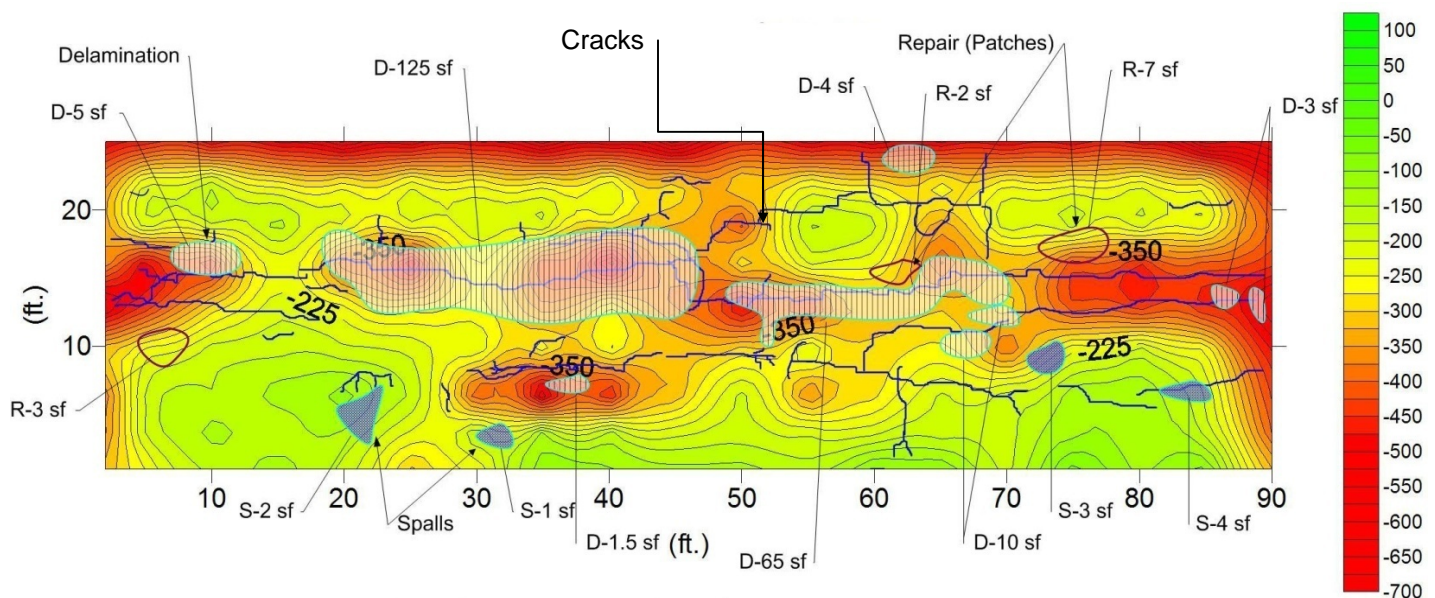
Sample plan drawing showing cracks, patches, spalls, delaminations, and half-cell potential data.
